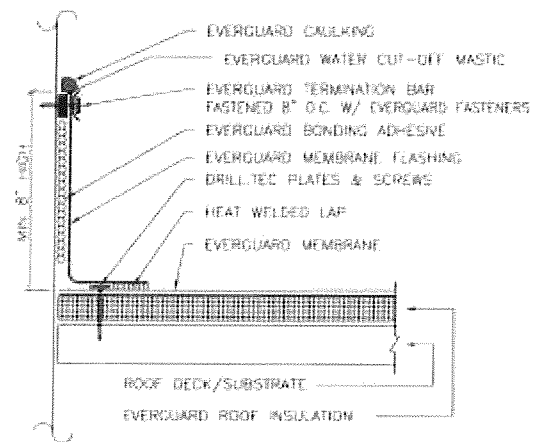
WALL FLASHING WITH TERMINATION BAR
